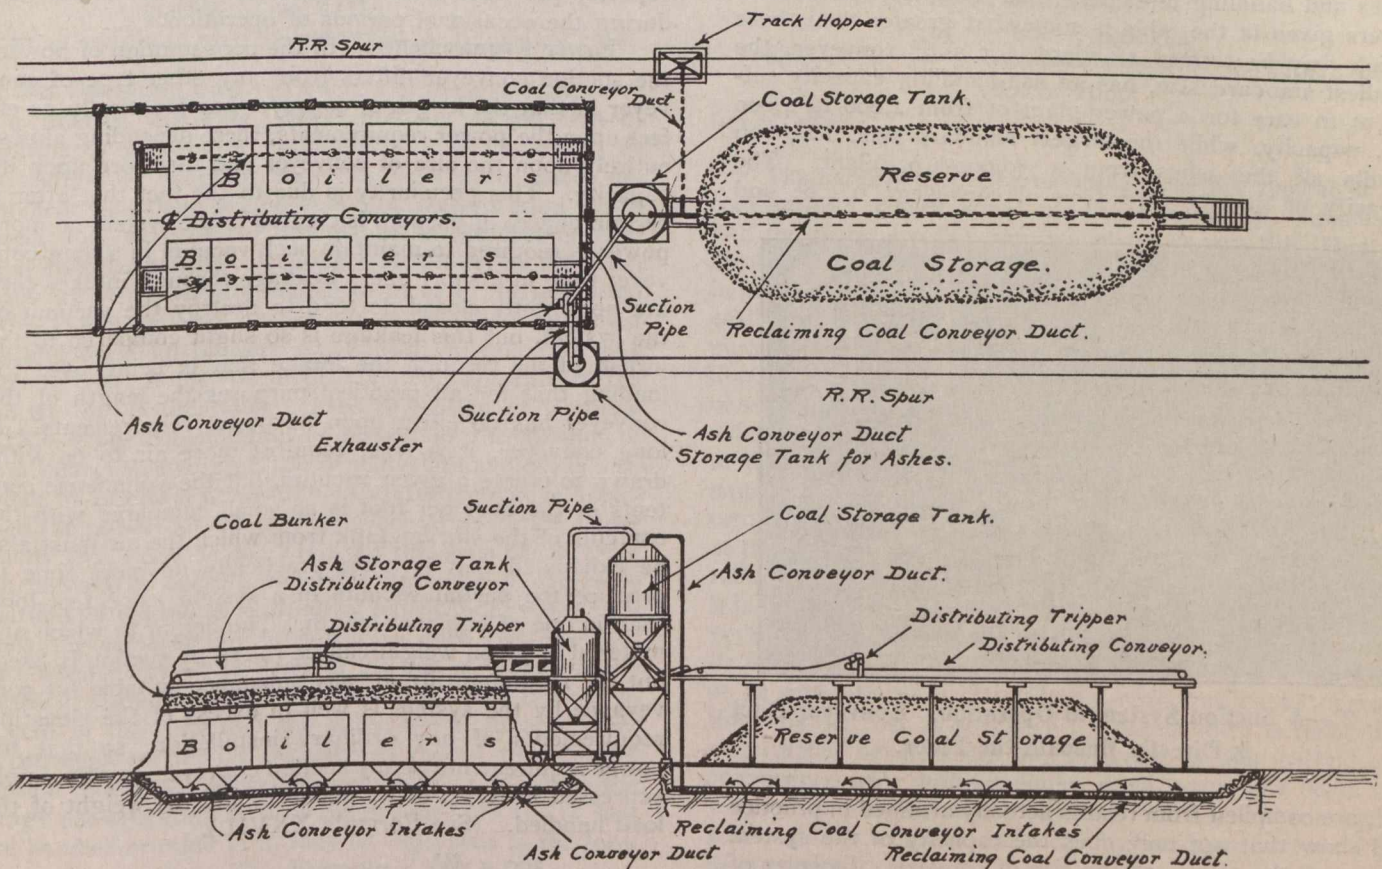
Typical Suction Conveyer Layout for Handling Both Ashes and Coal
